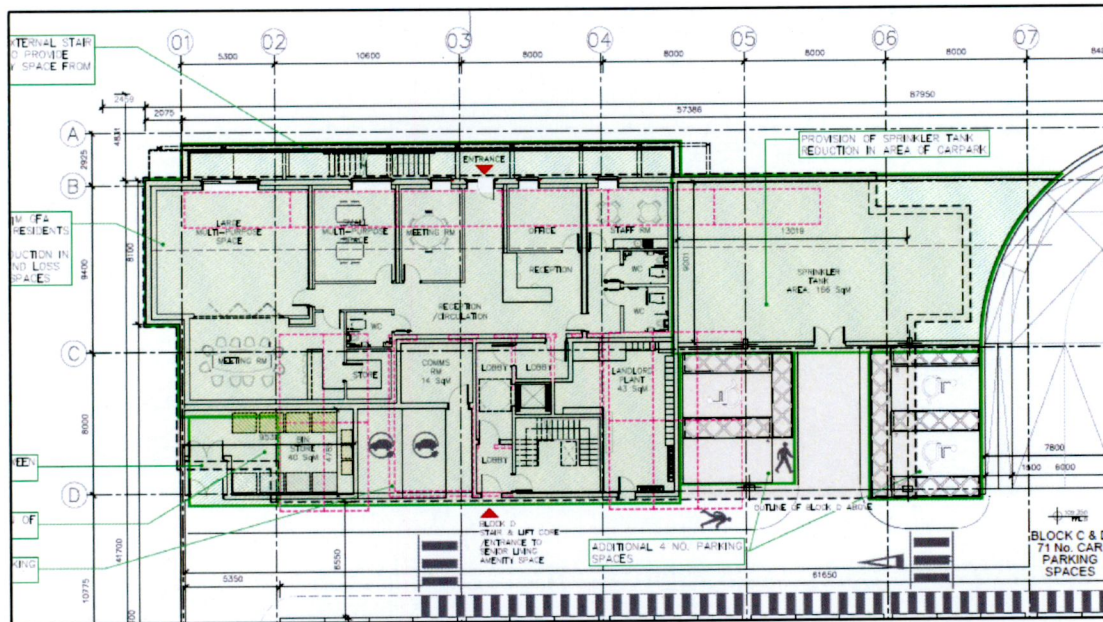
Extract from Drawing No. PA-100-CD (Proposed Basement Plan C&D) showing the proposed amendments within the basement of Block D (source: Darmody Architecture cropped and annotated by TPA, 2022.)
